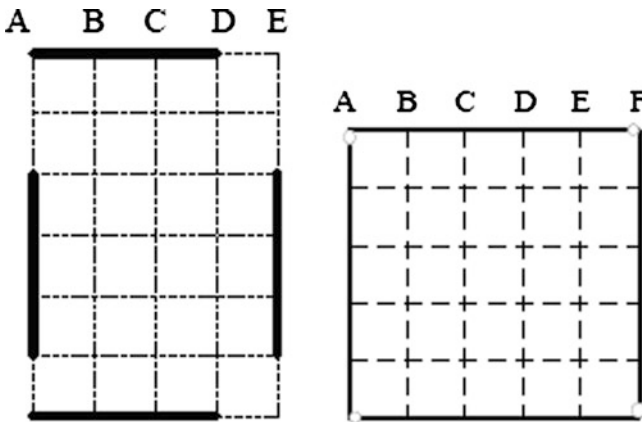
Floor plans of SAC buildings: 3- and 9-story showing location of moment-resisting frames (from left to right) (not to scale)
